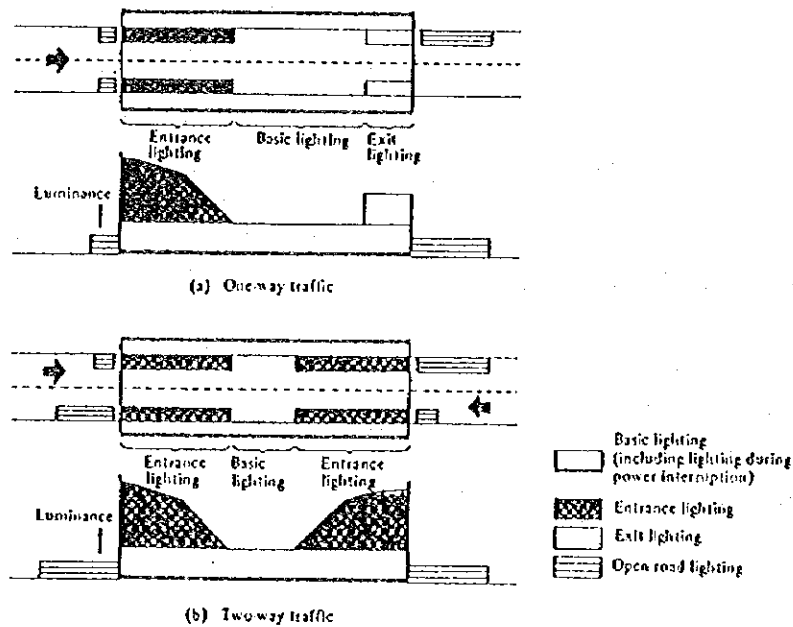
Schematic Layout of Tunnel Lighting
